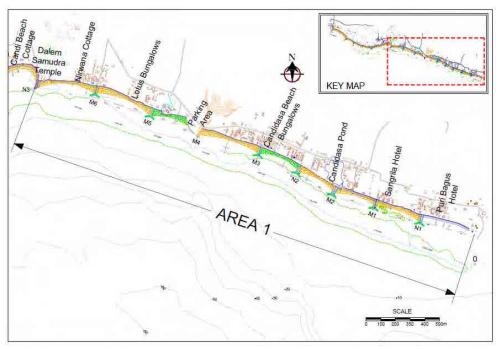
Layout Plan at Candidasa (Area 1, re-posted from Chapter 11)
